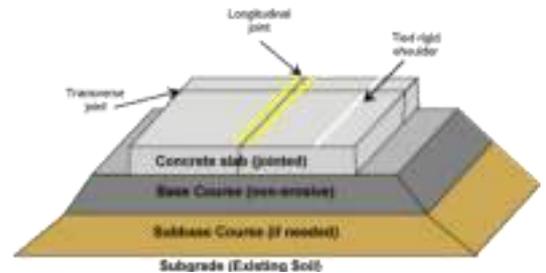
Schematic section of typical rigid pavements (Source: [17])
